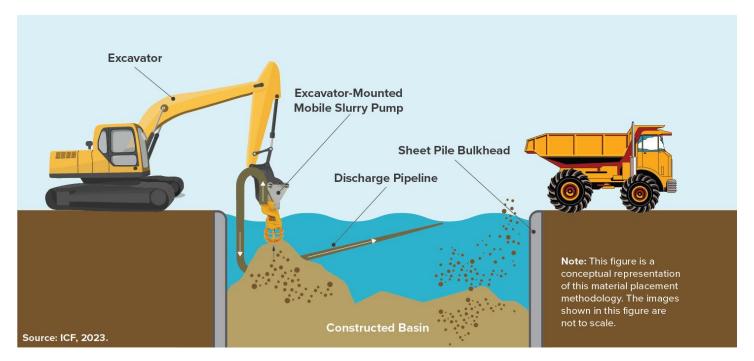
Material Placement Methodology: Hydraulic via Excavator-Mounted Mobile Slurry Pump
